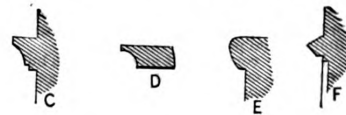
Details of Mouldings shown in Fig. 4.—Scale, 3 Inches to the Foot.
